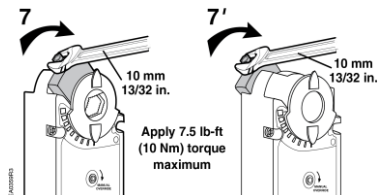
Fasten the Shaft Adapter to the Damper Shaft.
